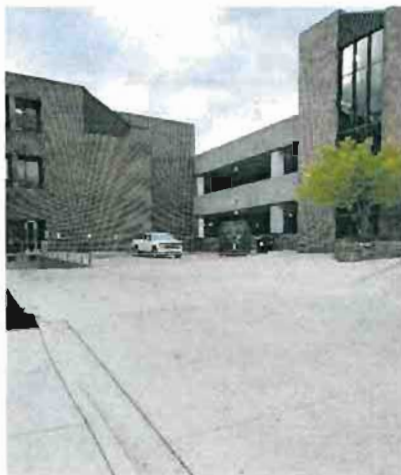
South Side Gannon Deck – looking northwest at structure and Gannon building
